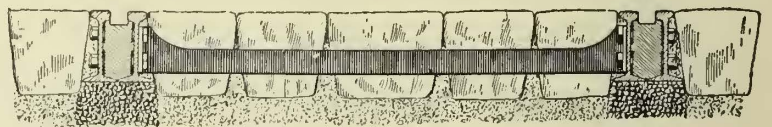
TRACK CONSTRUCTION—HALLE ELECTRIC RAILWAY.
